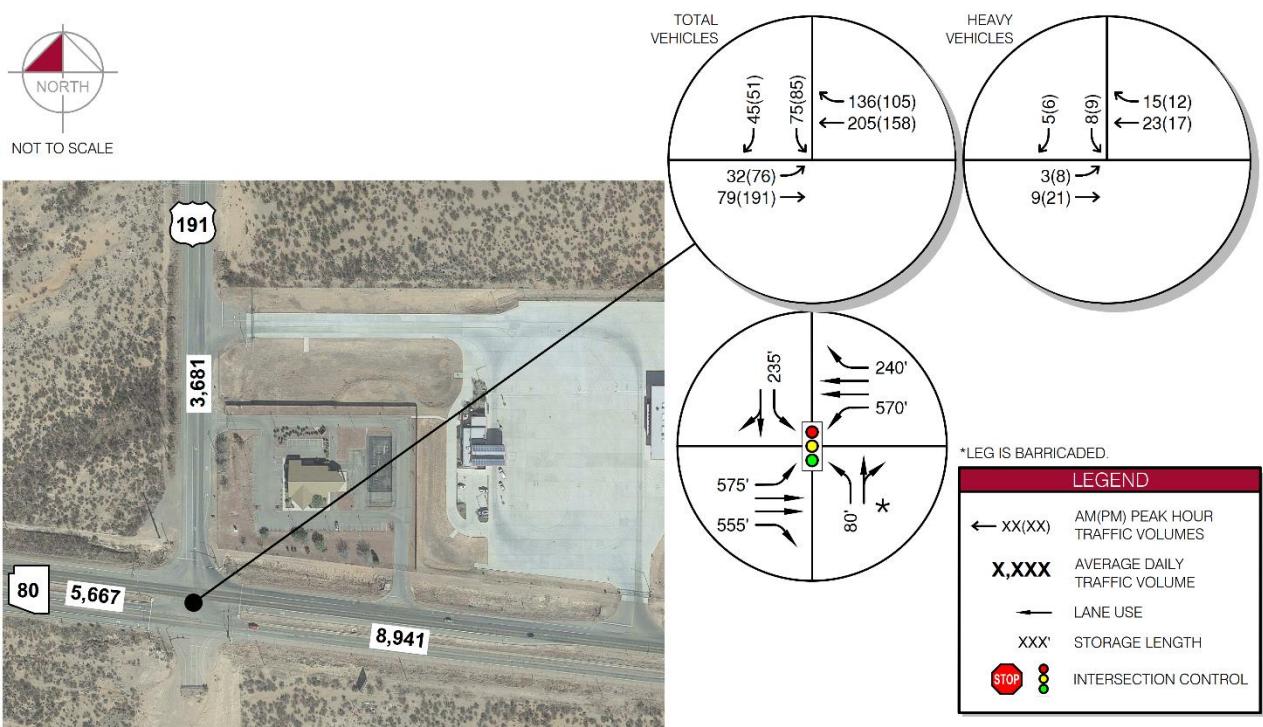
Existing Conditions: SR 80 / US 191 Intersection
